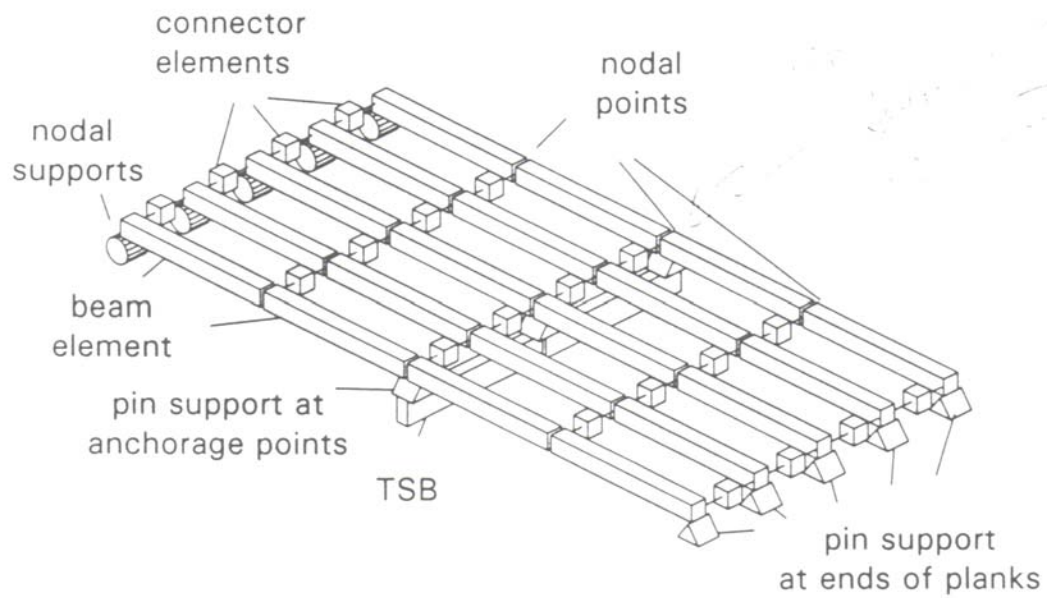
Model of the Bridge Showing Planks, Nails, TSB
